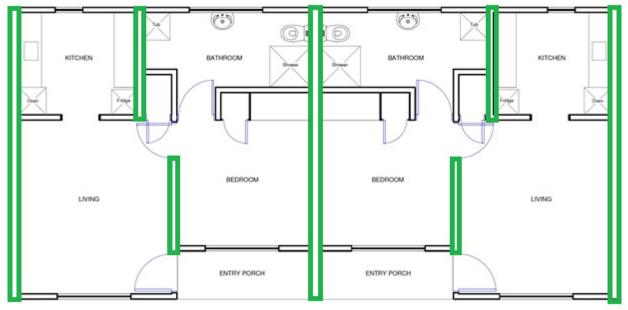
Walls used for bracing in the transverse direction (Units 26-35).
